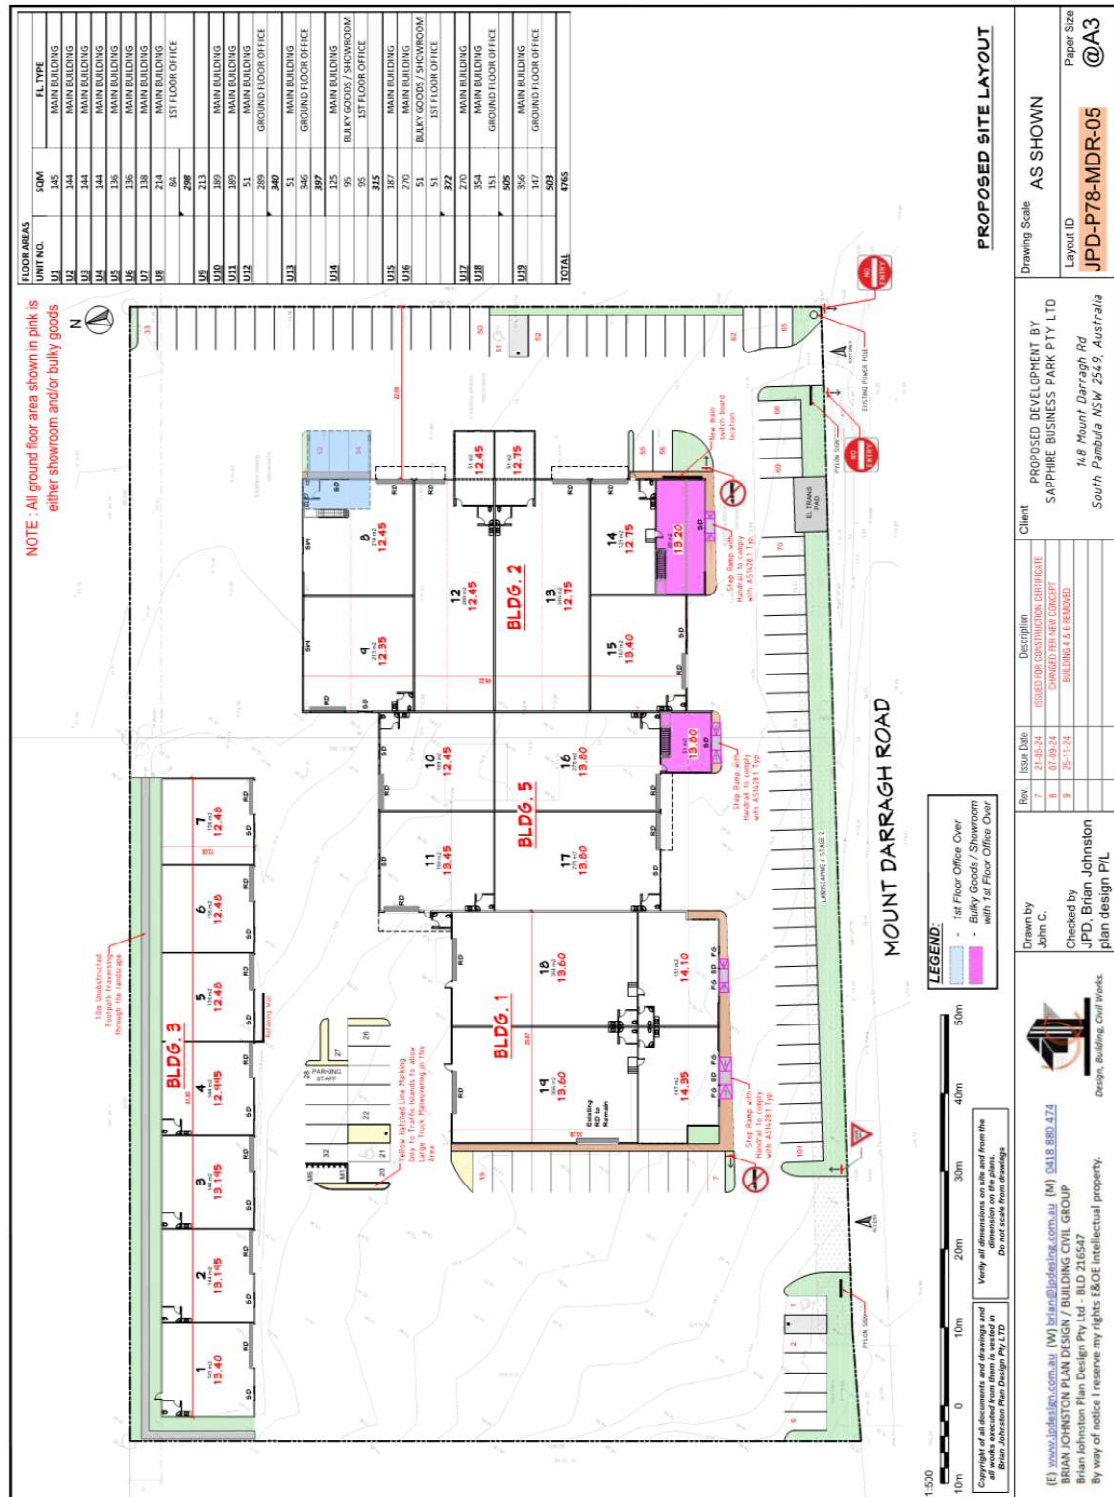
Proposed Adjusted Development Site Plan 25.11.2024 (NTS)
